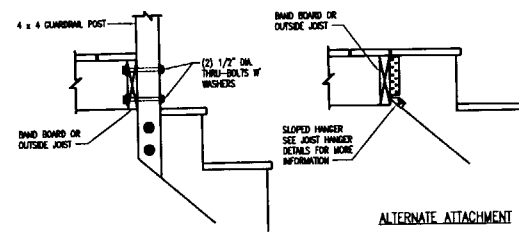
STAIR STRINGER CONNECTION DETAIL
